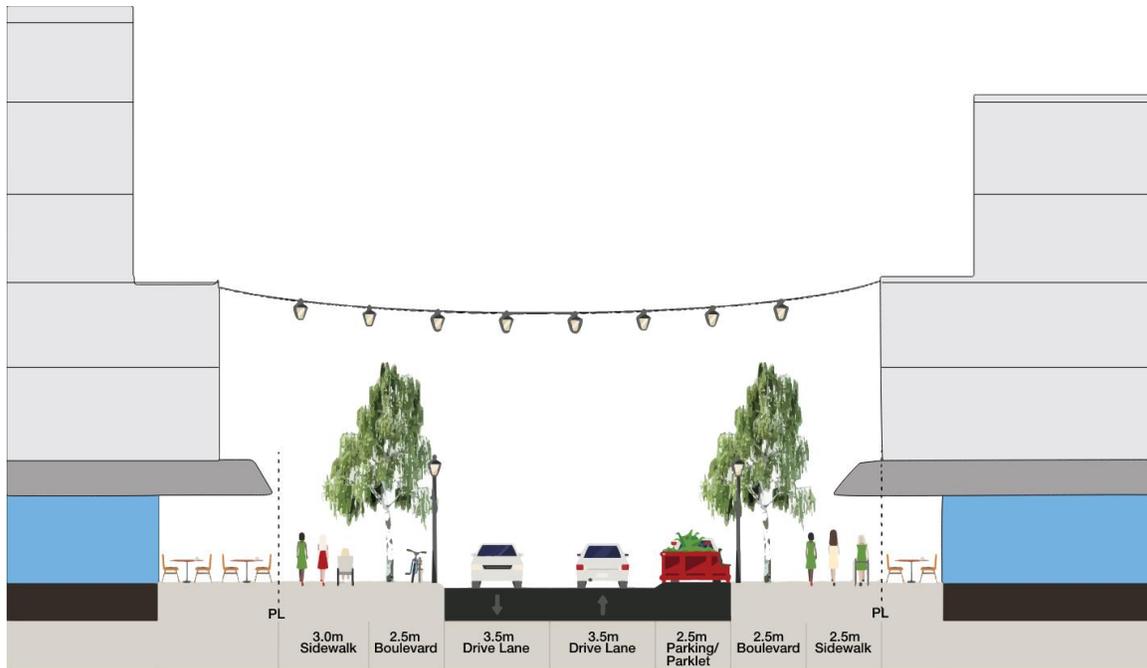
Conceptual cross section for Oak Street (20 metres)
